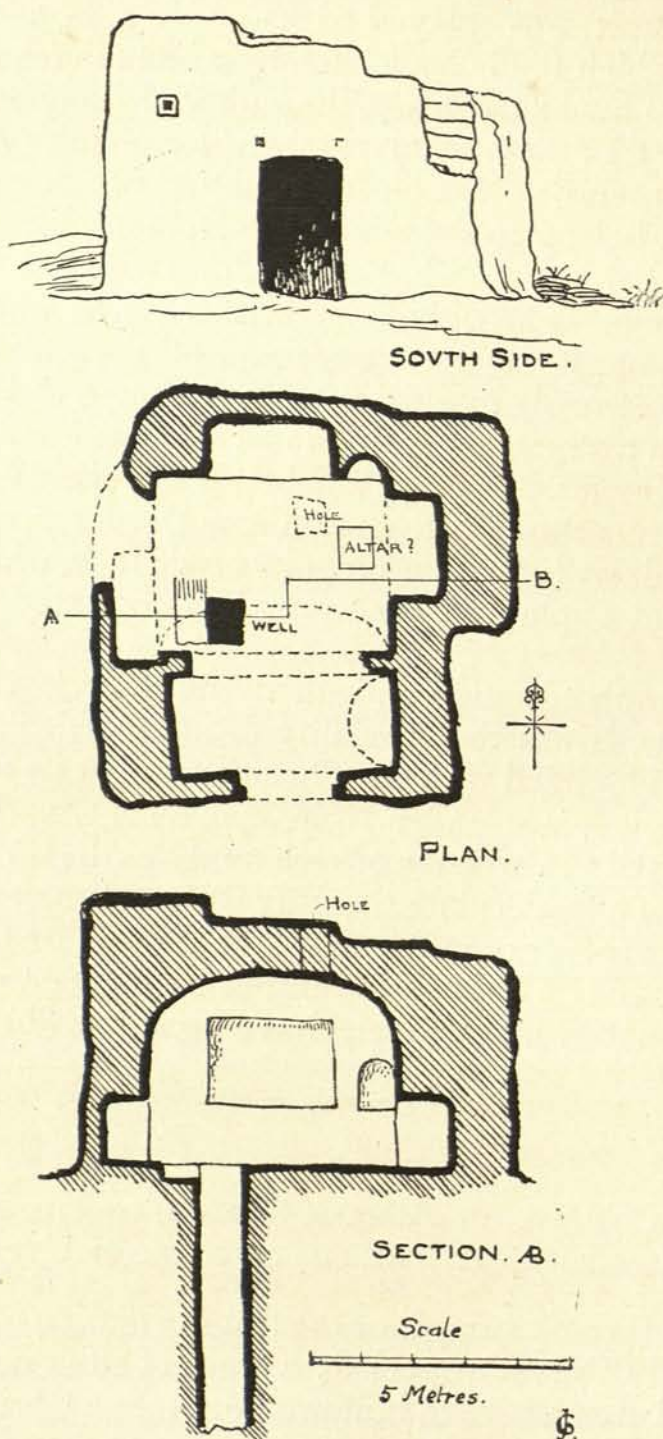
Rock-hewn chapel of Acheiropoietos: elevation, plan, and section.
